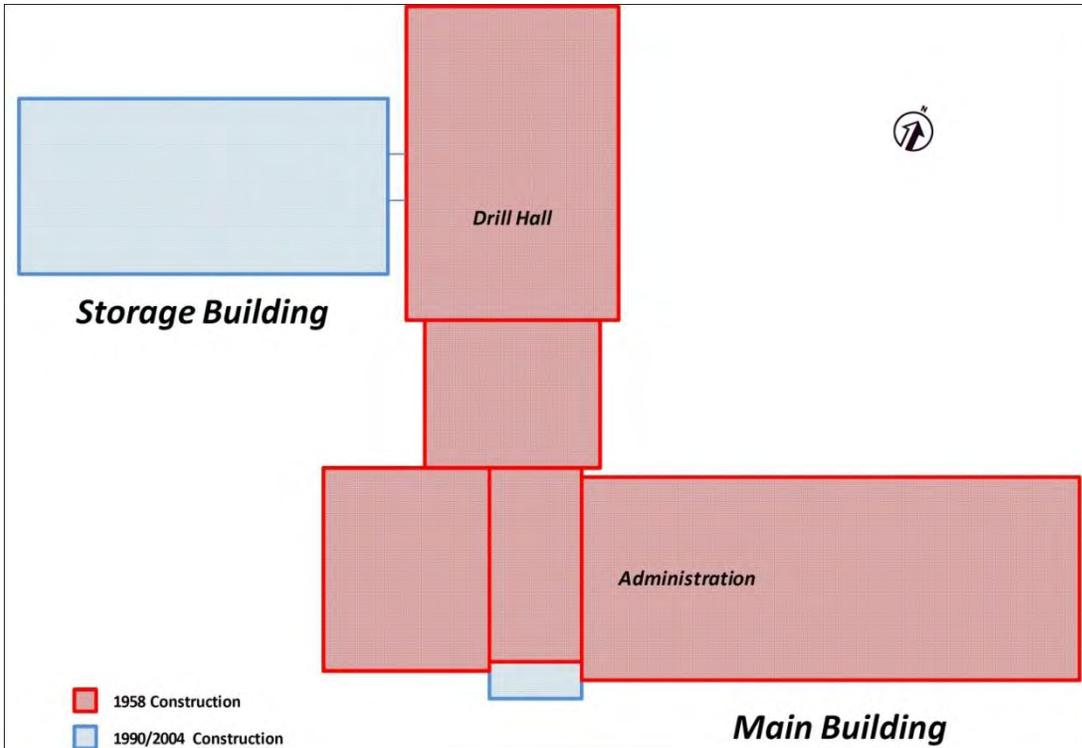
Current architectural floor plan of Main Building and Storage Building (altered from ECP [not to scale]).
